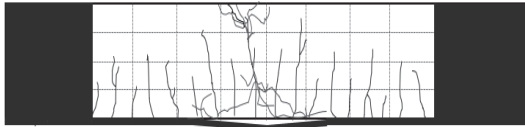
Cracking pattern of specimen strengthened with carbon fiber sheet and end anchorage
